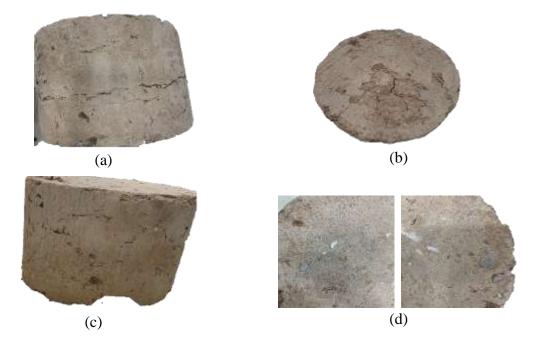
(a) Cemented soil. (b) Top view of cemented soil, (c) Fiber reinforced cemented soil has reduced cracks, and (d) Top view of Fiber reinforced cemented soil
